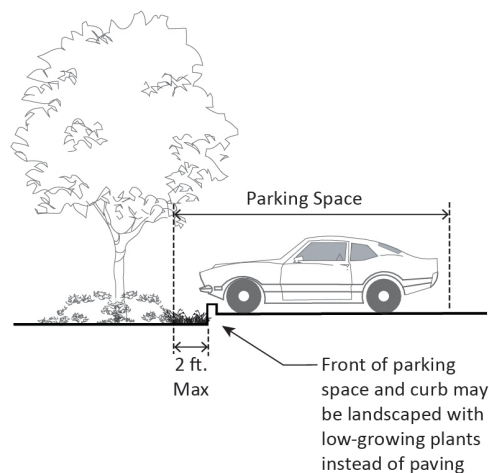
F.2: PARKING SPACE SURFACING, LANDSCAPING ALTERNATIVE
